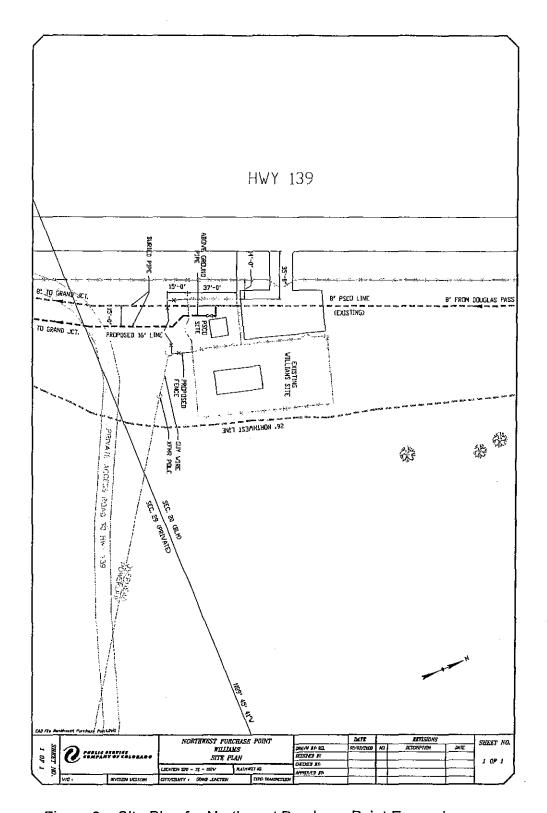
Site Plan for Northwest Purchase Point Expansion
